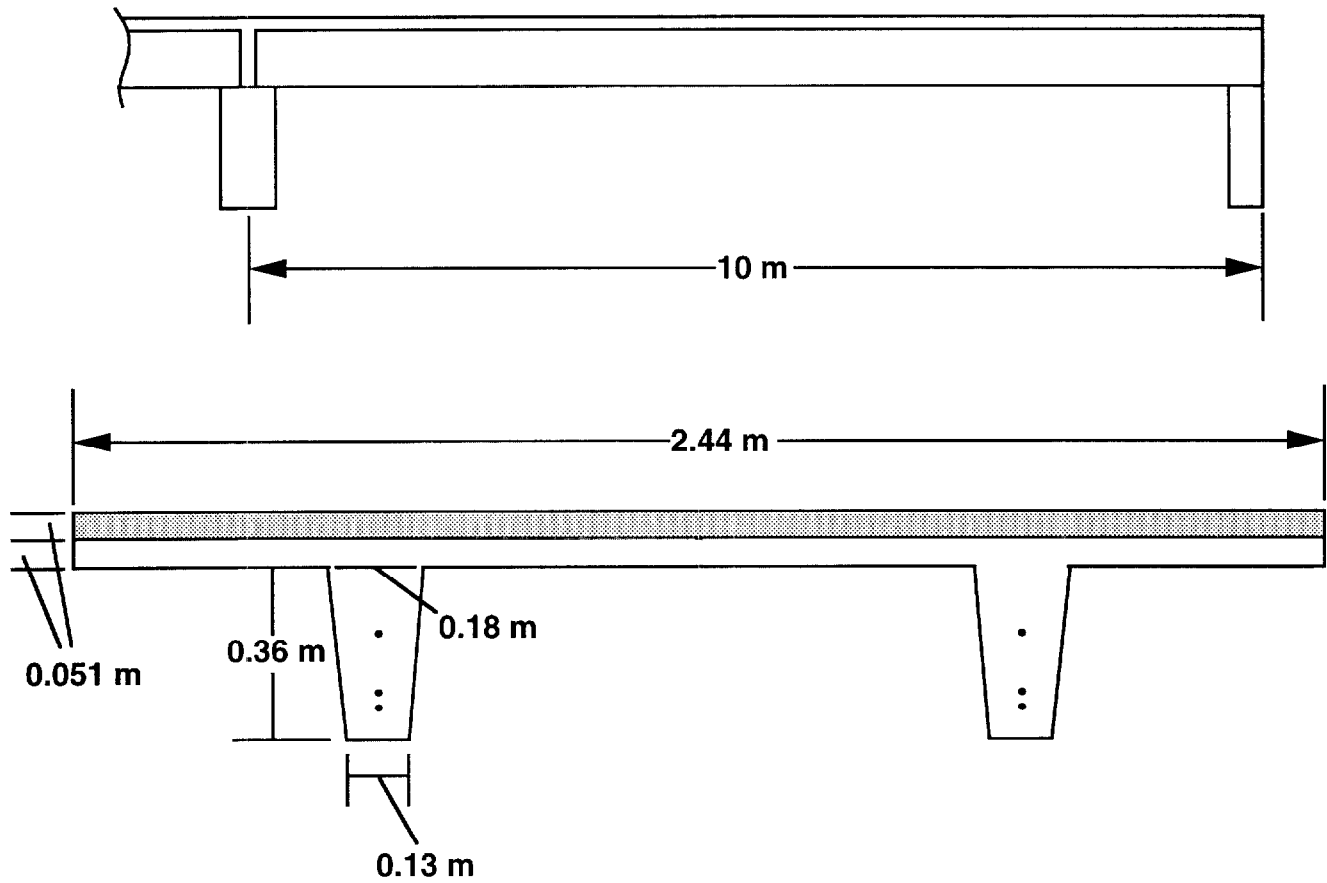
Sketch of a section of a reinforced-concrete, beam/slab, floor/ceiling system (from Problem 5.3 of Reference [9]).
